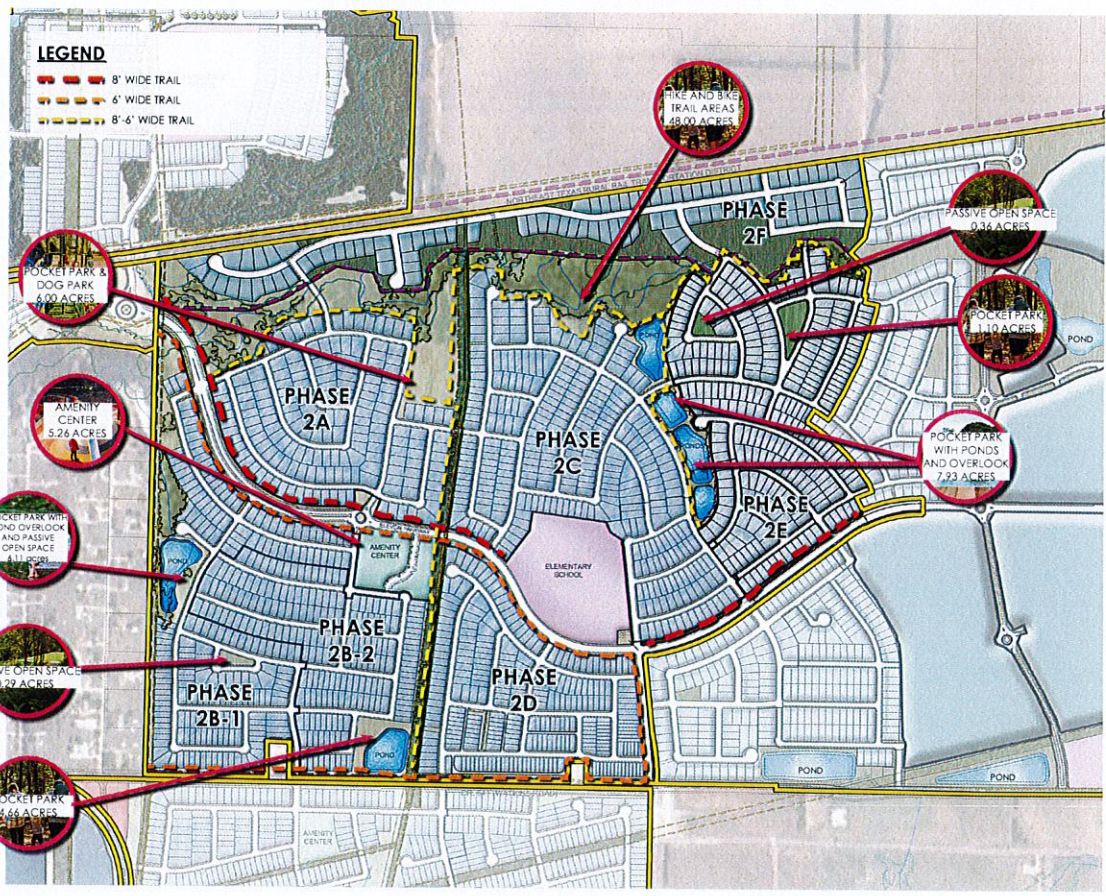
EXHIBIT E - PARKS, OPEN SPACES AND TRAILS
